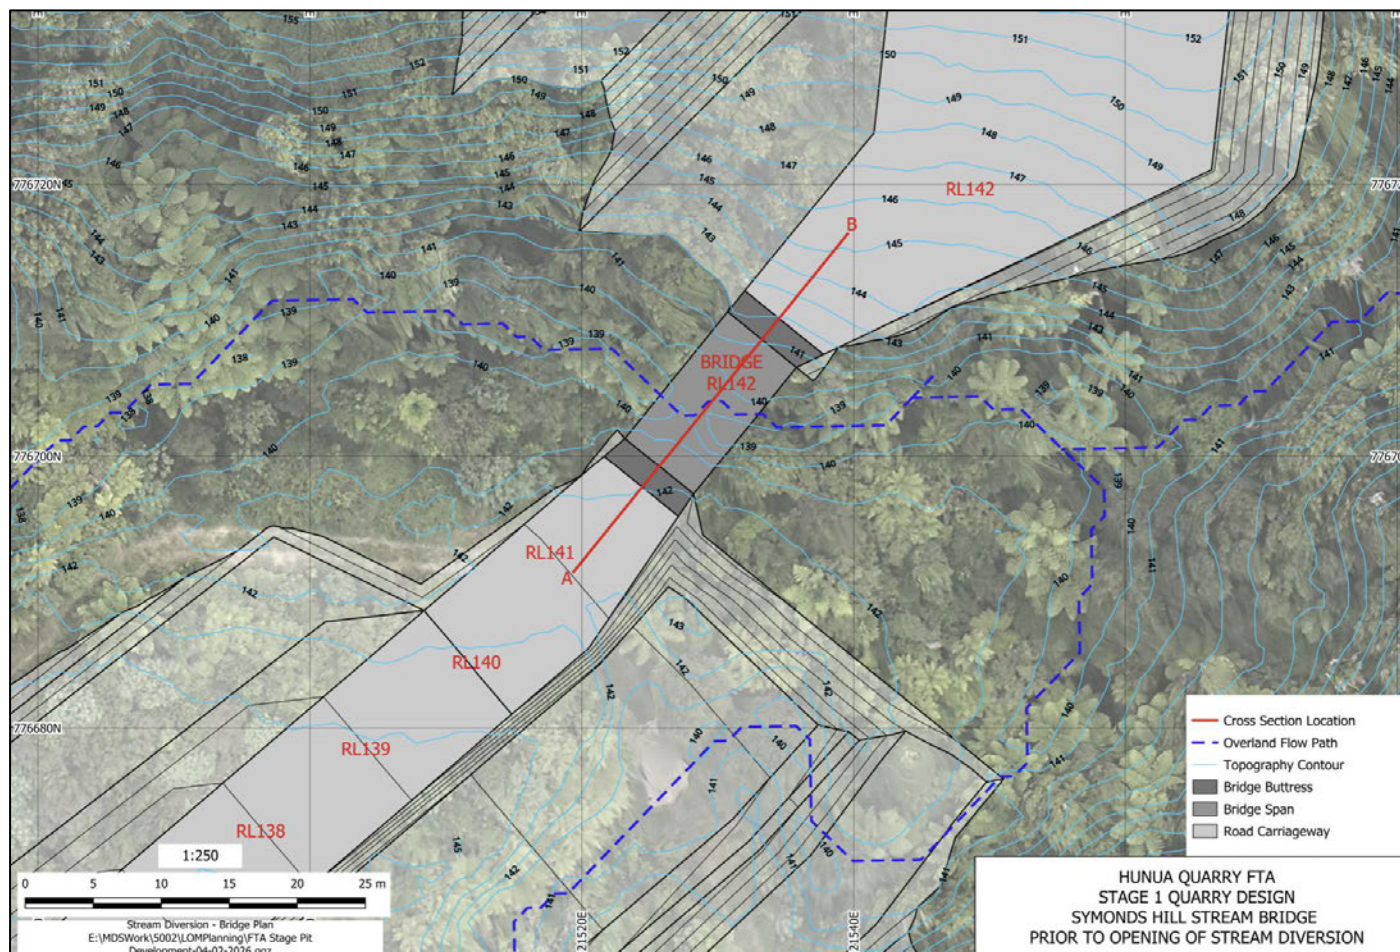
Plan showing the proposed temporary bridge in Stage 1 (source: Winstones)
